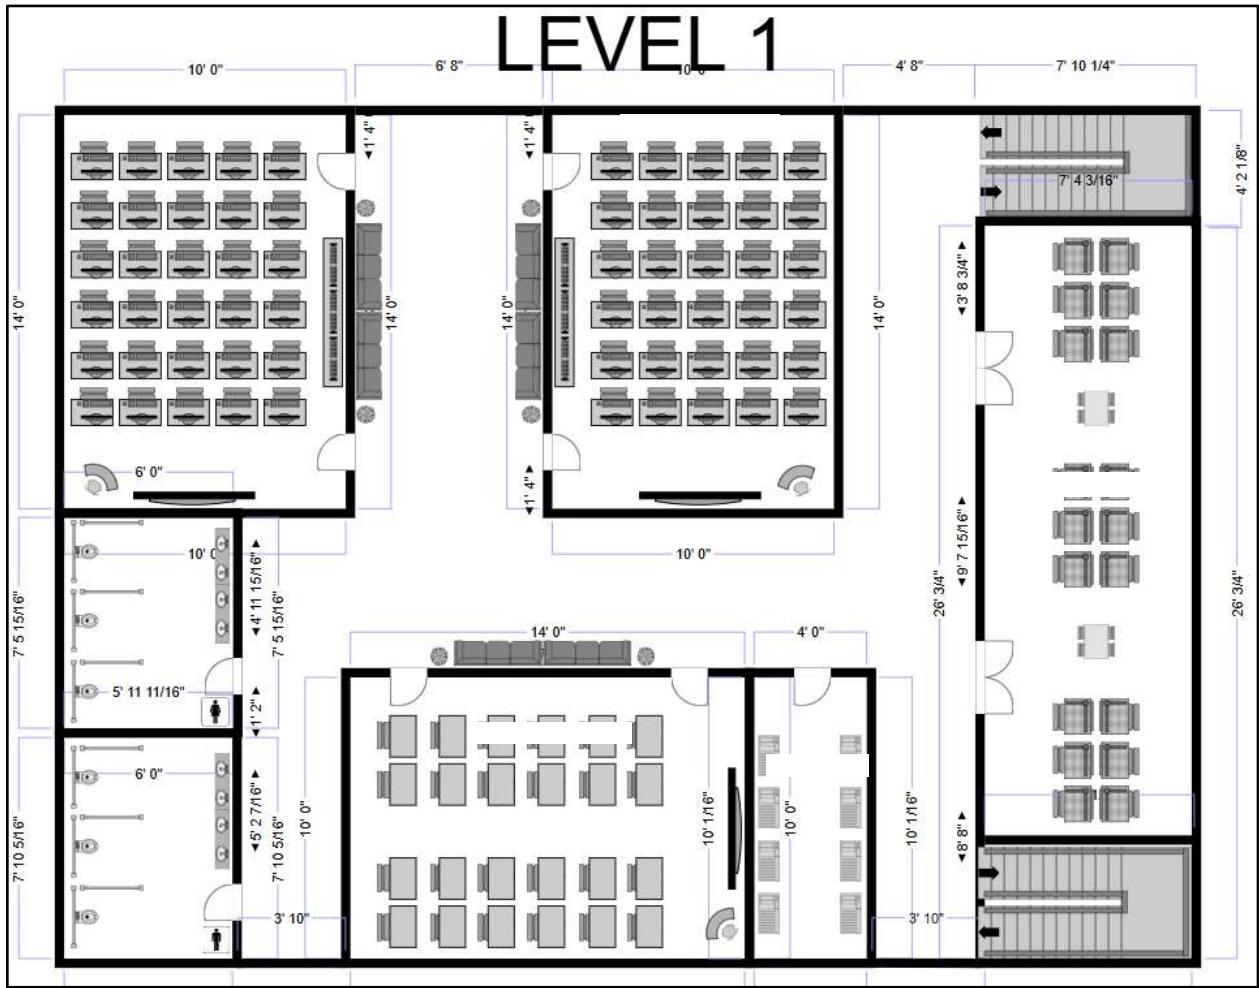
Floor Plan for 1st Floor (L1) of Block N28B
